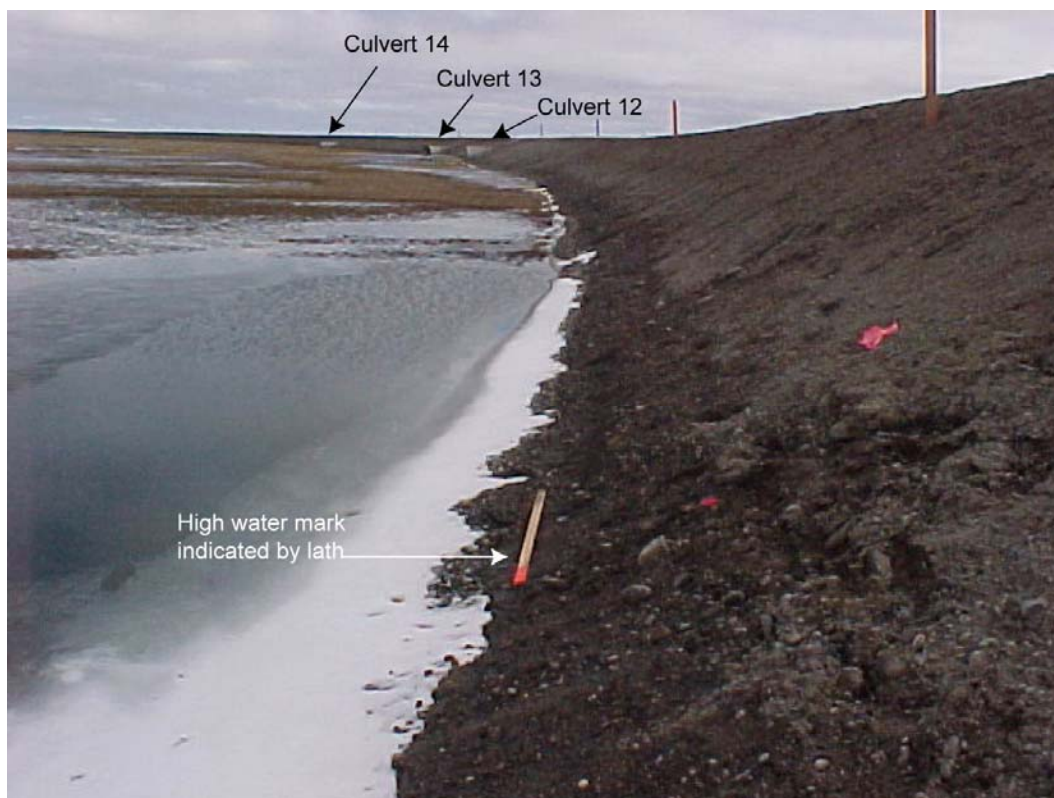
Facing east from Culvert #11 along the north side of the CD-2 access road. (5/31/02)
